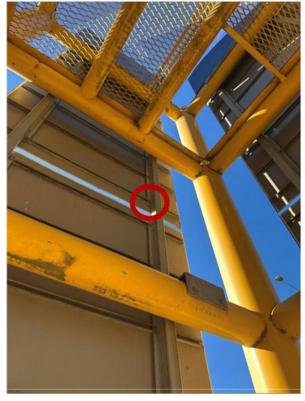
33-47 Mumford Road, Waterloo Corner SA External Signage Structure Missing Bolt
